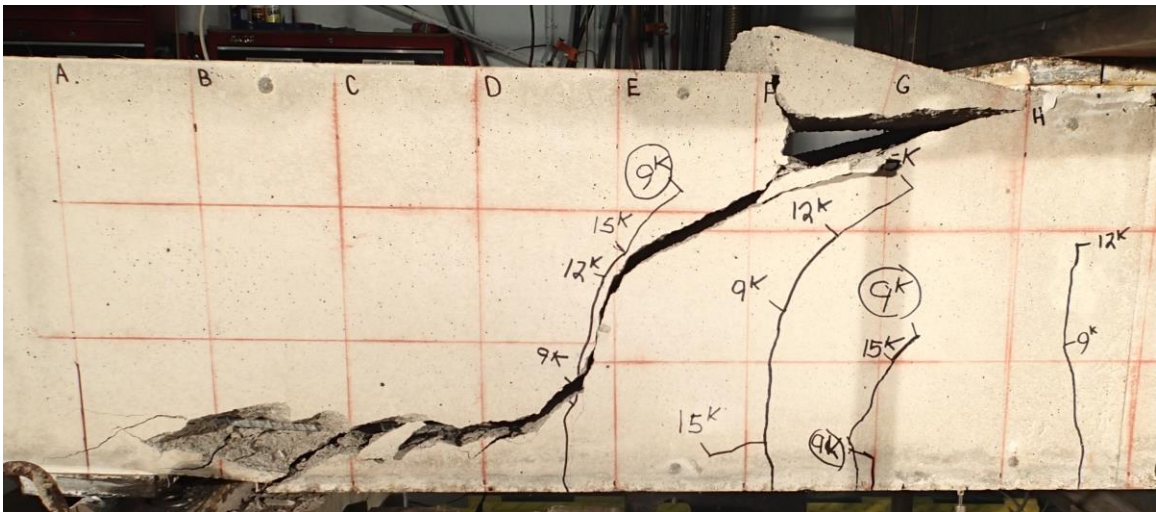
Specimen H-2: North Side Failure Inclined Crack
